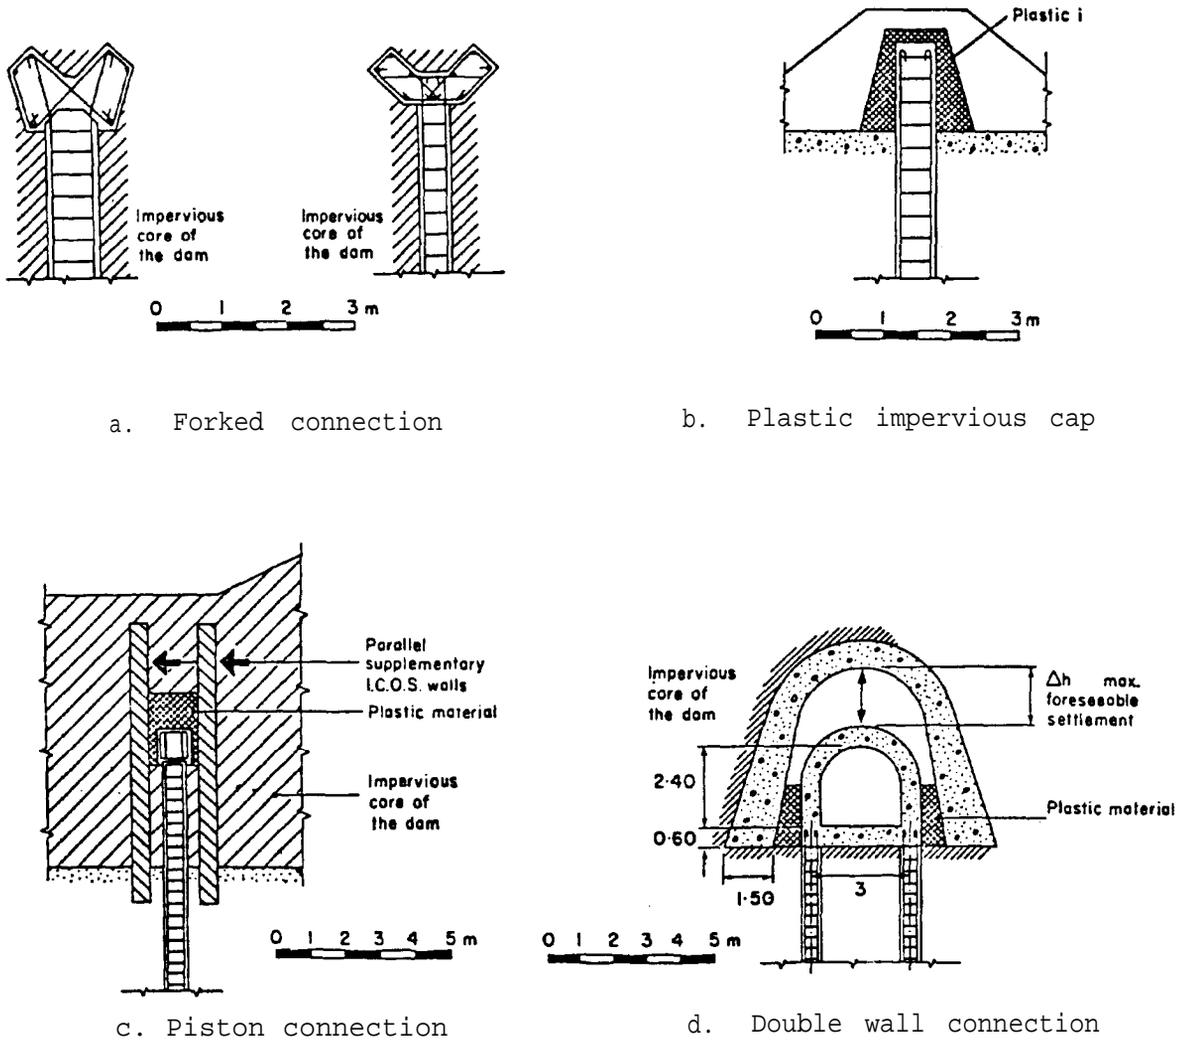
Connections between concrete cutoff wall and core of dam (courtesy of ICOS¹⁸²)
